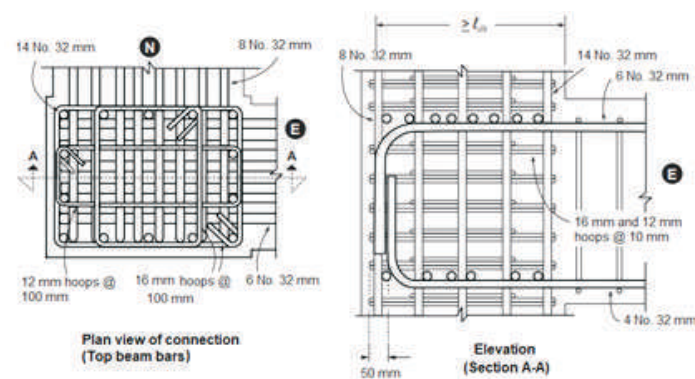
Example of typical exterior joint detailing (Adapted from Moehle and Hopper, 2016)
